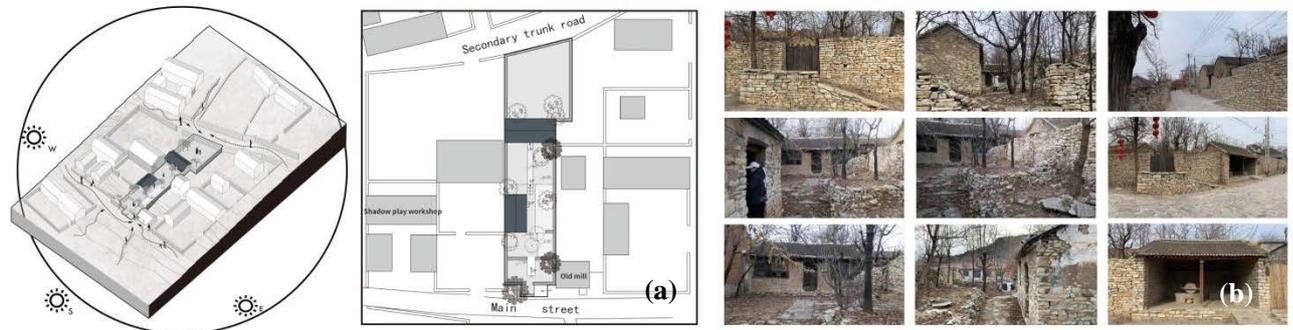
(a) Aerial View and Plan of No.4 Base; (B) Survey Photos of No.4 Base
